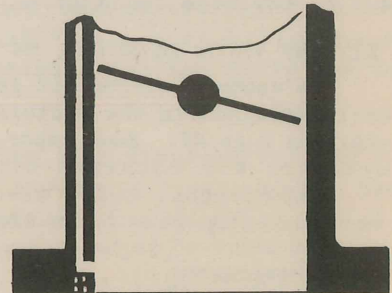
The opening to the bottom of the flange may be plugged. Drill the plug out.
